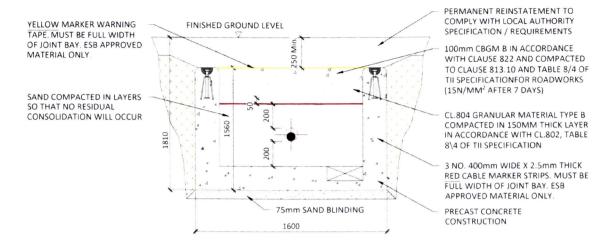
Typical Elevation of Joint Bay installed in Roadway
